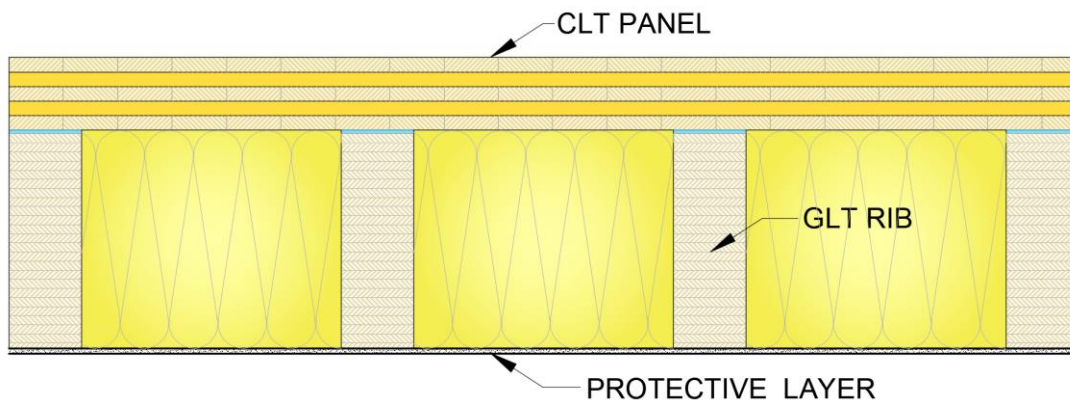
h: CLT Rib Panel with straight protective layer to the soffit of the ribs and filled with insulation
